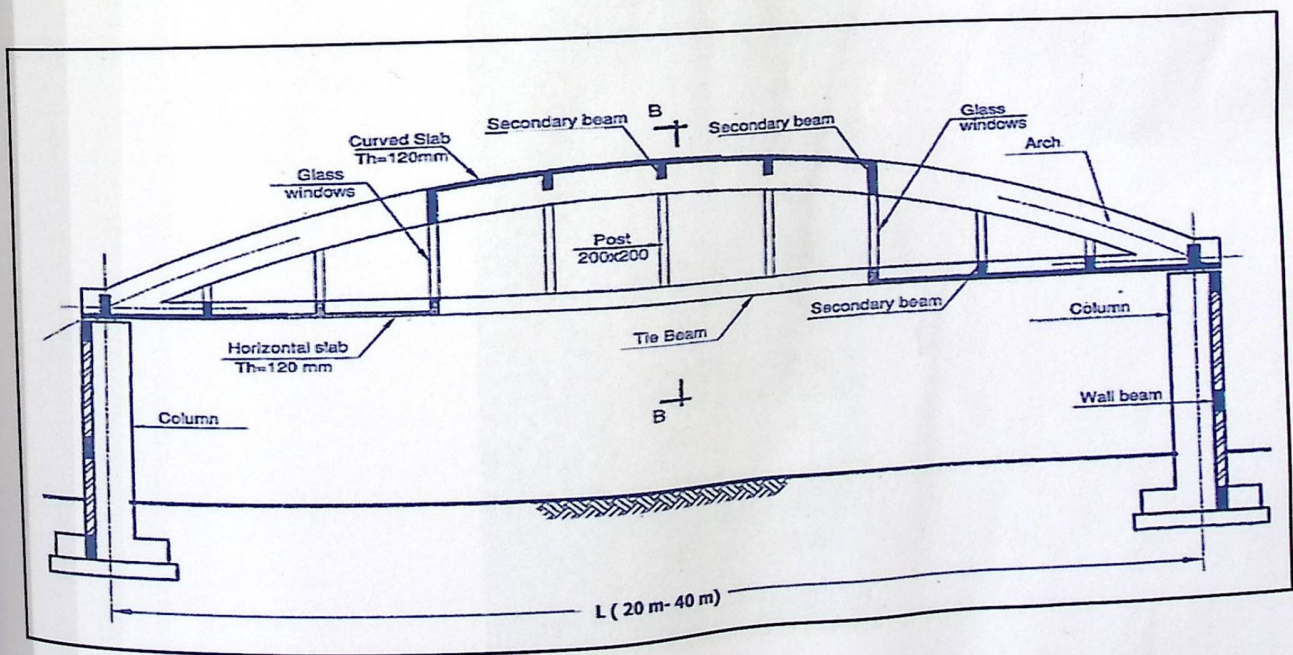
An arched girder supporting a roof with variable levels.
